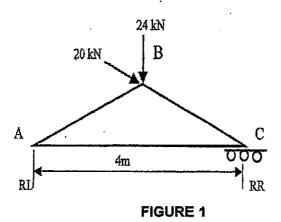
shows a loaded roof truss, with TWO forces at the apex and a pitch of 30° at both sides. The roof truss is supported on a hinge at RL and rests by means of rollers at RR.
